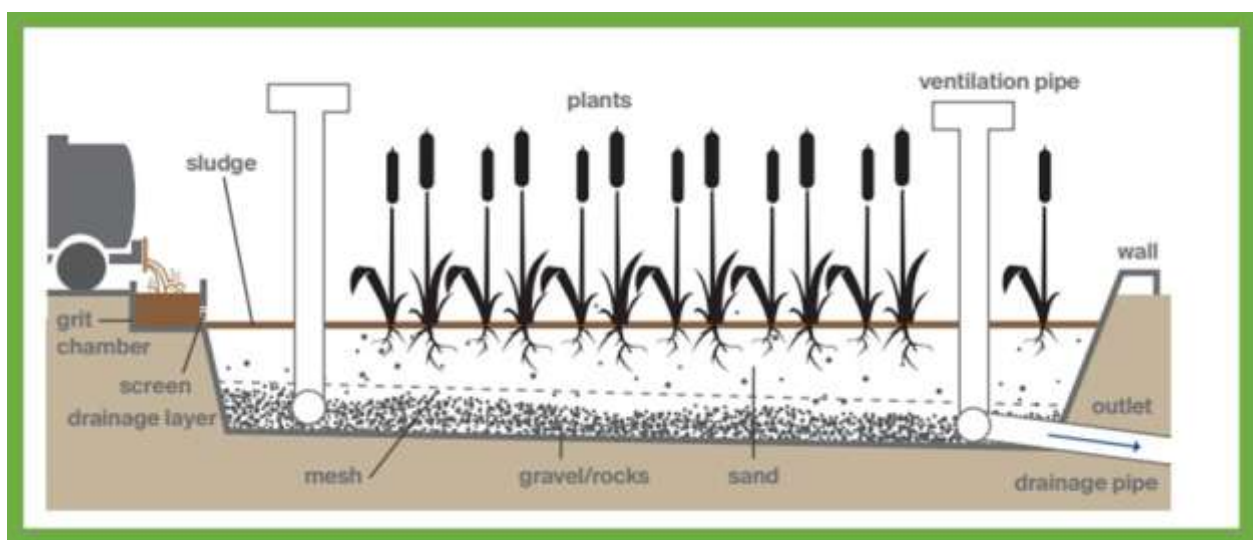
Schematics sketch of a suggested layout of a planted drying bed
